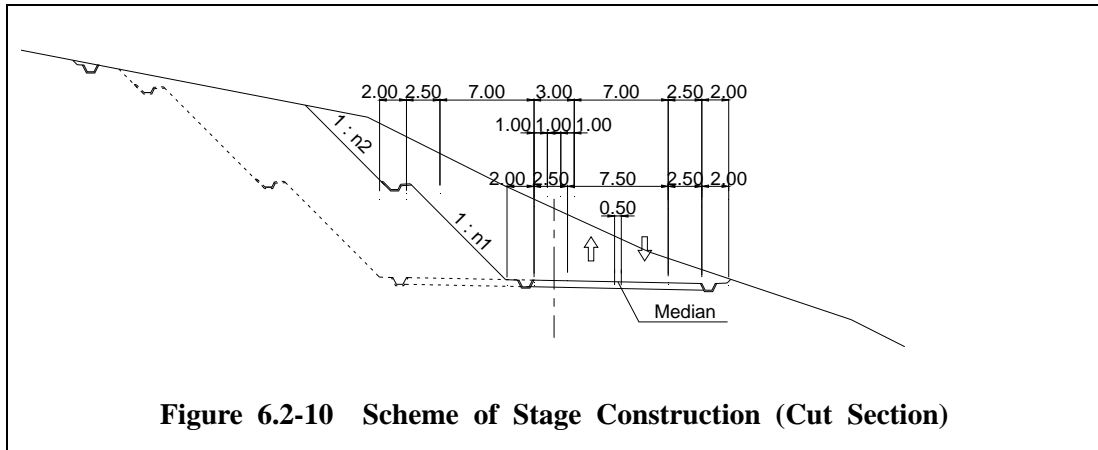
Scheme of Stage Construction (Cut Section)
